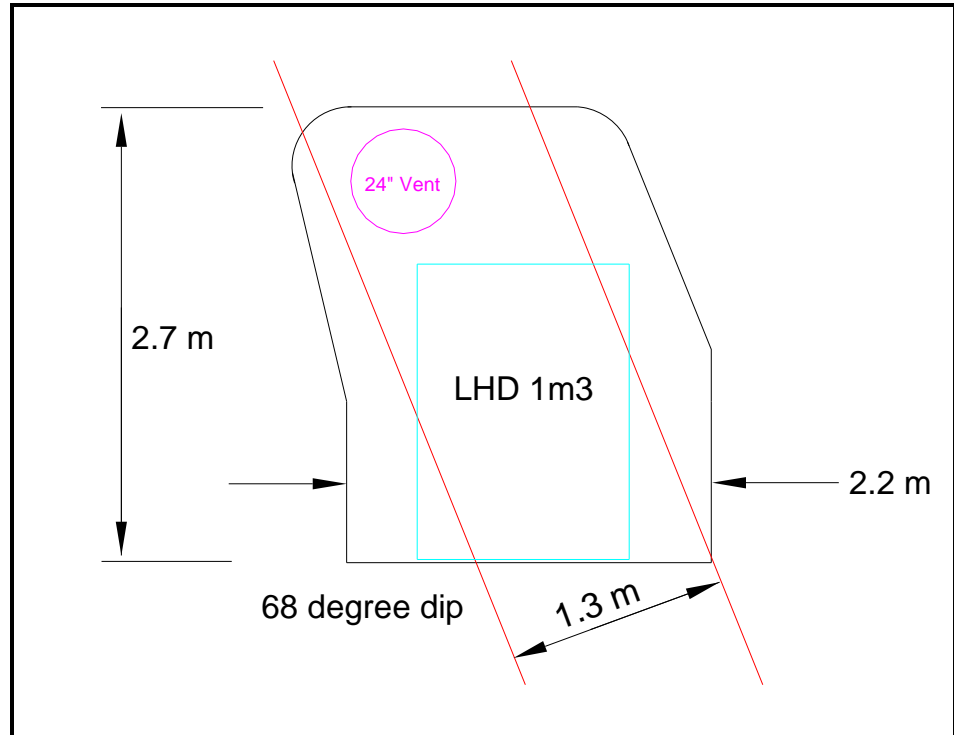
SW E block Mining Cross Section – Minimum Mechanized Width
